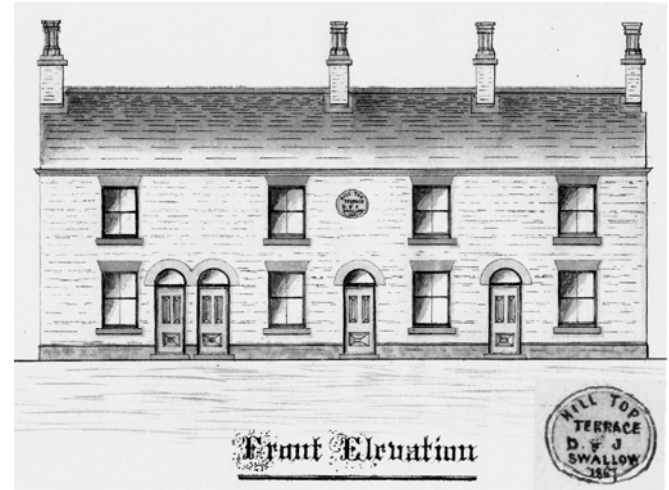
Architect's elevation of four cottages at Hill Top Terrace, 1867 (copied from original plans)
